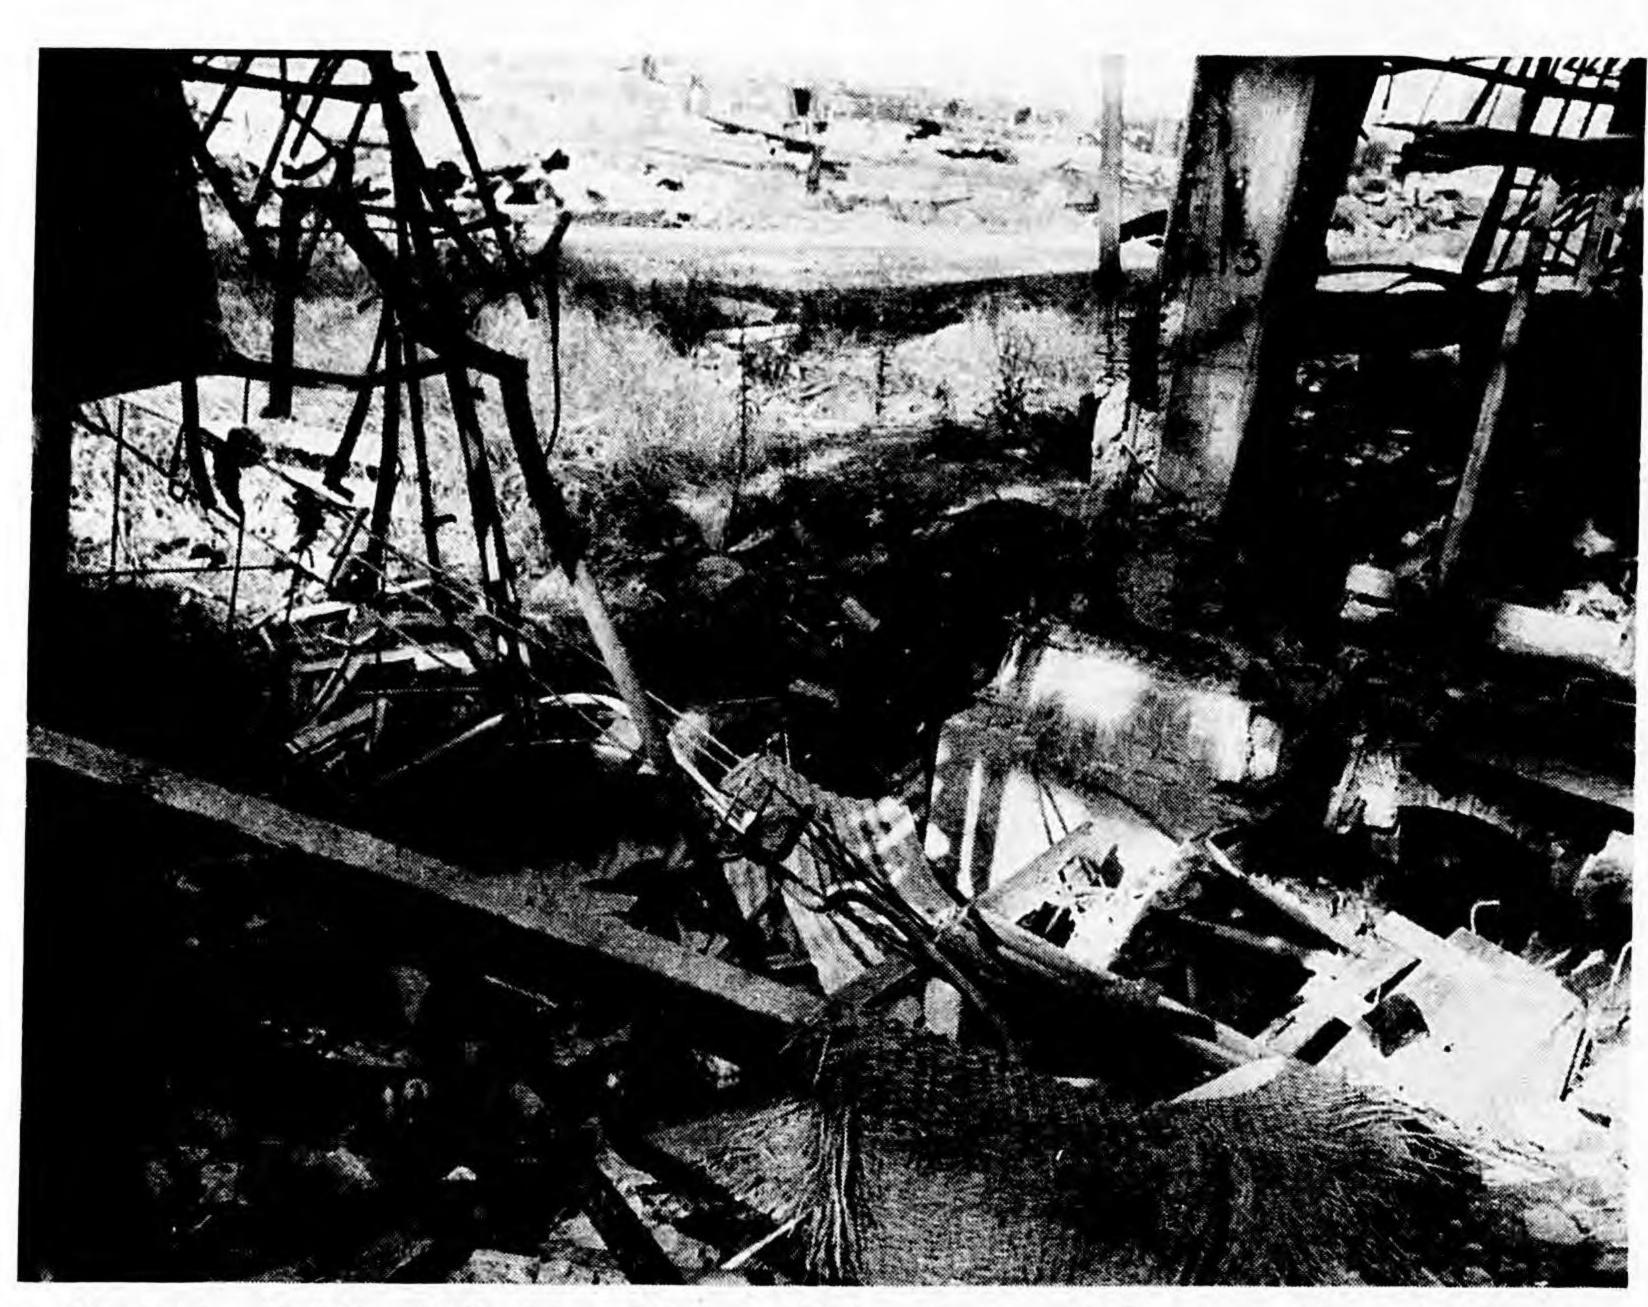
Building 302b; base of Column A13 undamaged by cratering bomb looking N.
